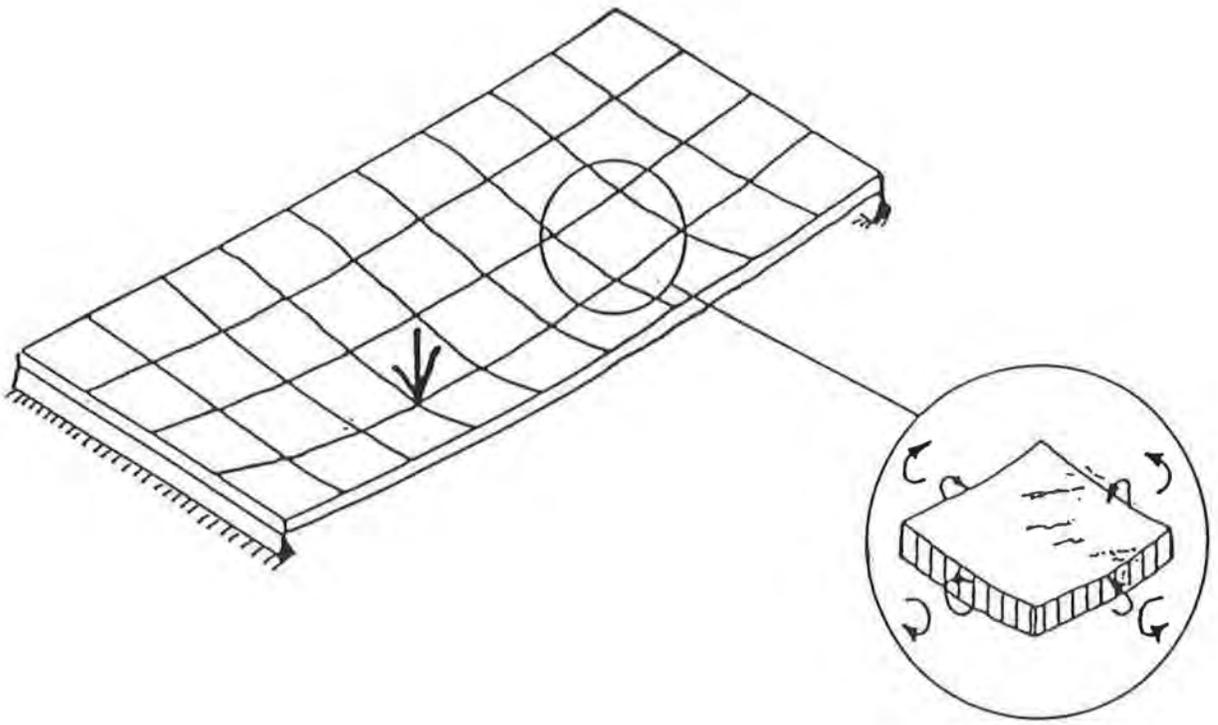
Bridge Deck Deformations and Moments From a Truck Tire Loading (16)
